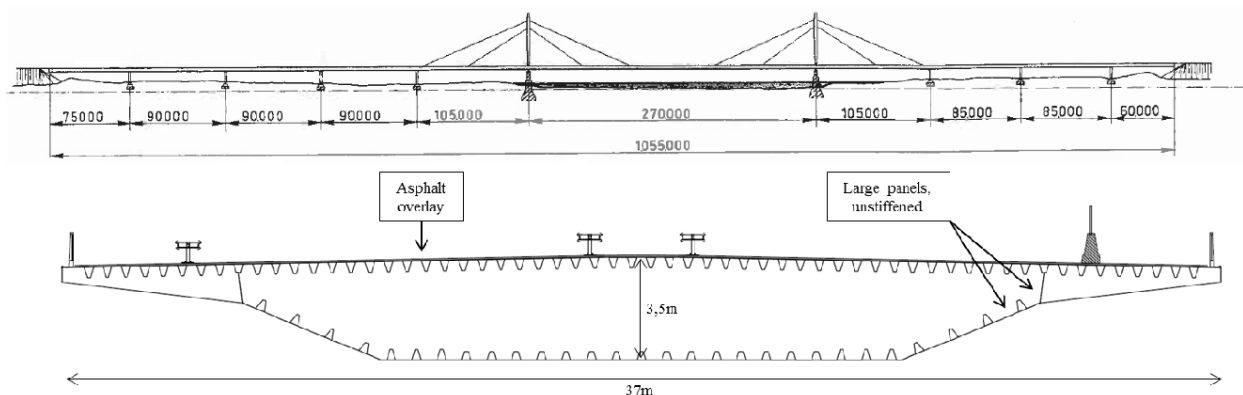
ELEVATION AND DECK STRUCTURE OF THE EWIIK BRIDGE (FLINT ET AL., 2013).
